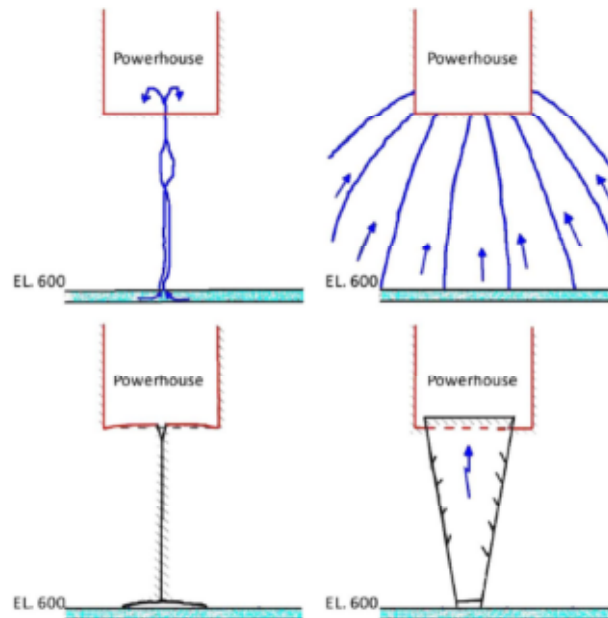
Potential failure modes due to hydrofracture, excessive seepage, wedge failure and beam failure – clockwise from top [80]
